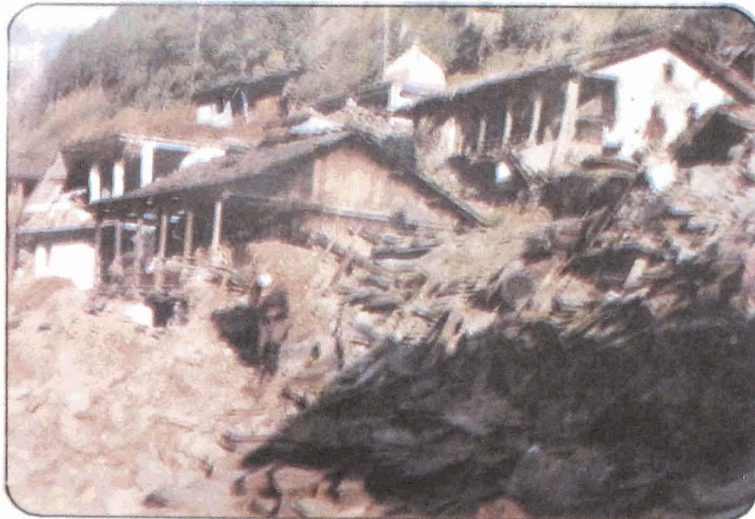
Partial to complete collapse of houses in Dedsari village. Note an intact house made of timber logs and planks.
